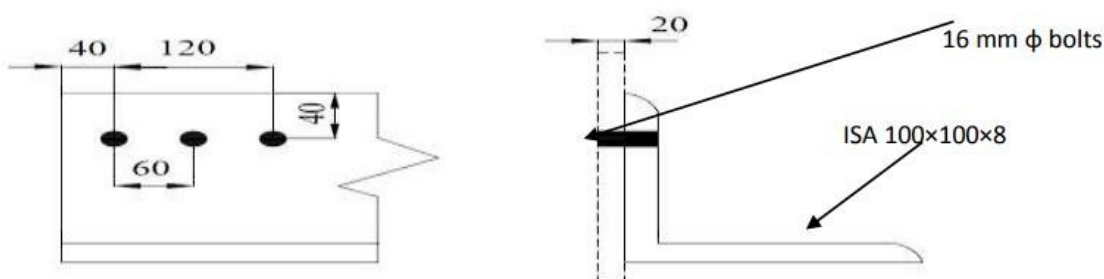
Design Details of diagonal member (All dimensions are in mm).
